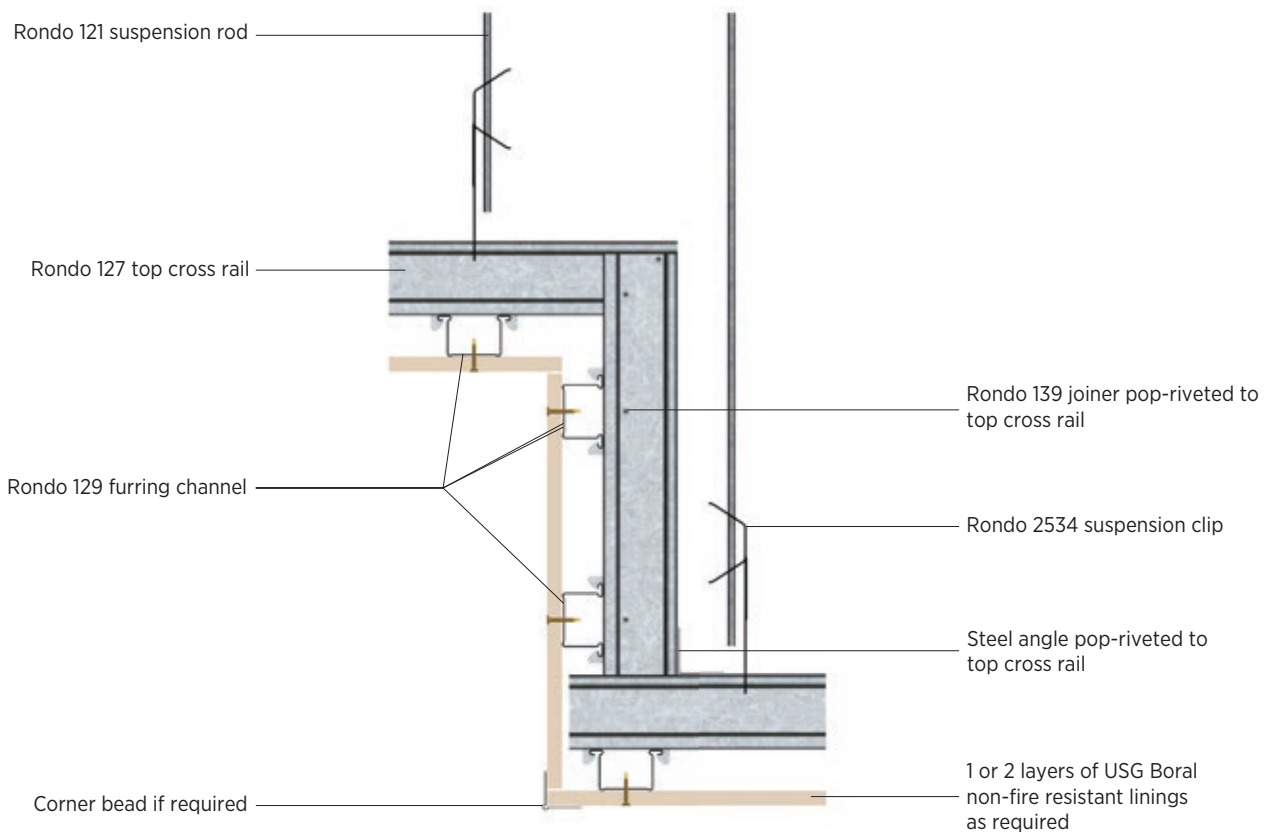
Typical Bulkhead Detail - Section Through Furring Channel
